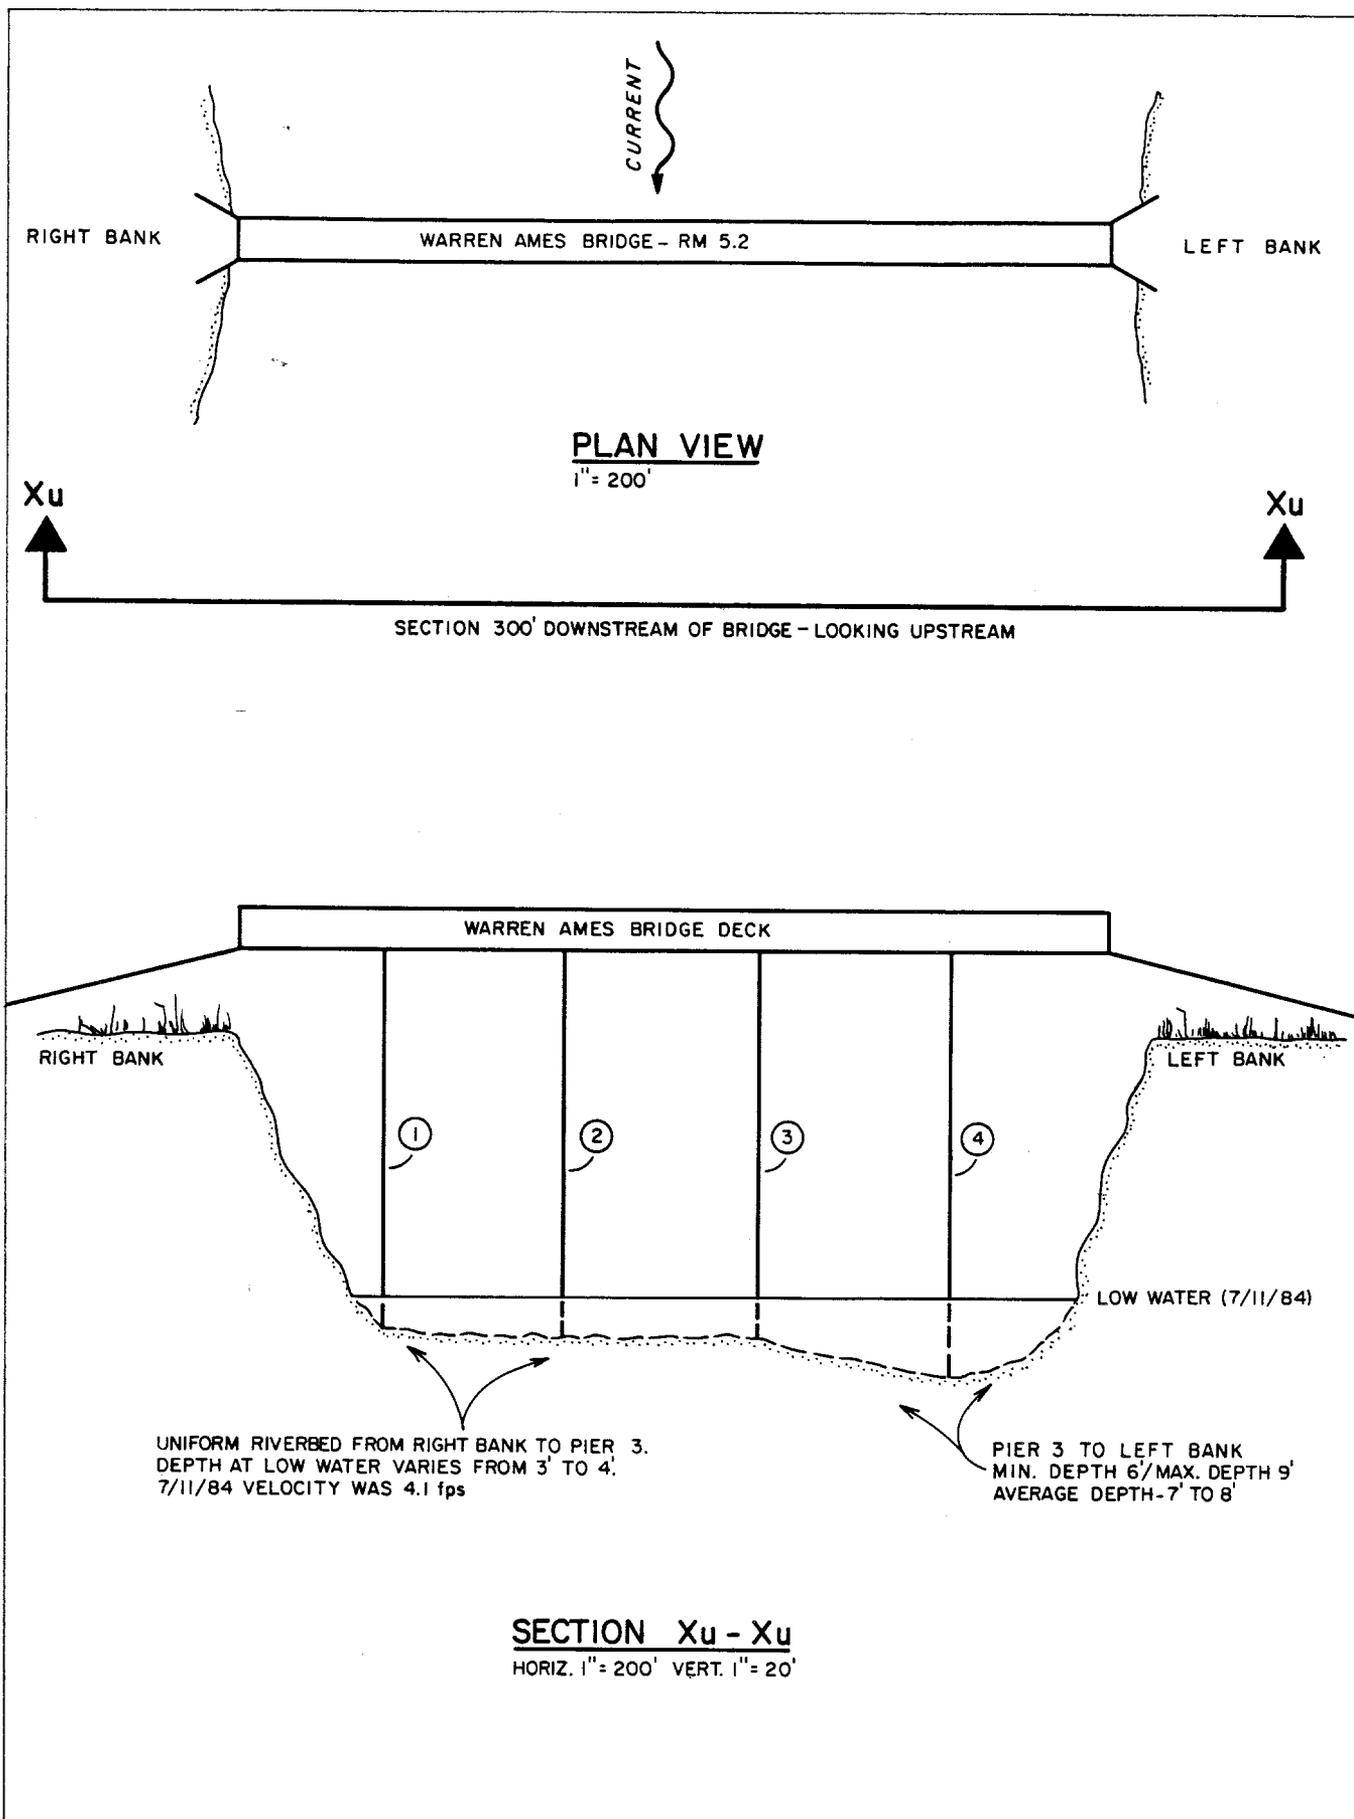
Weir site at RM 5.0 (section downstream of bridge looking upstream).
